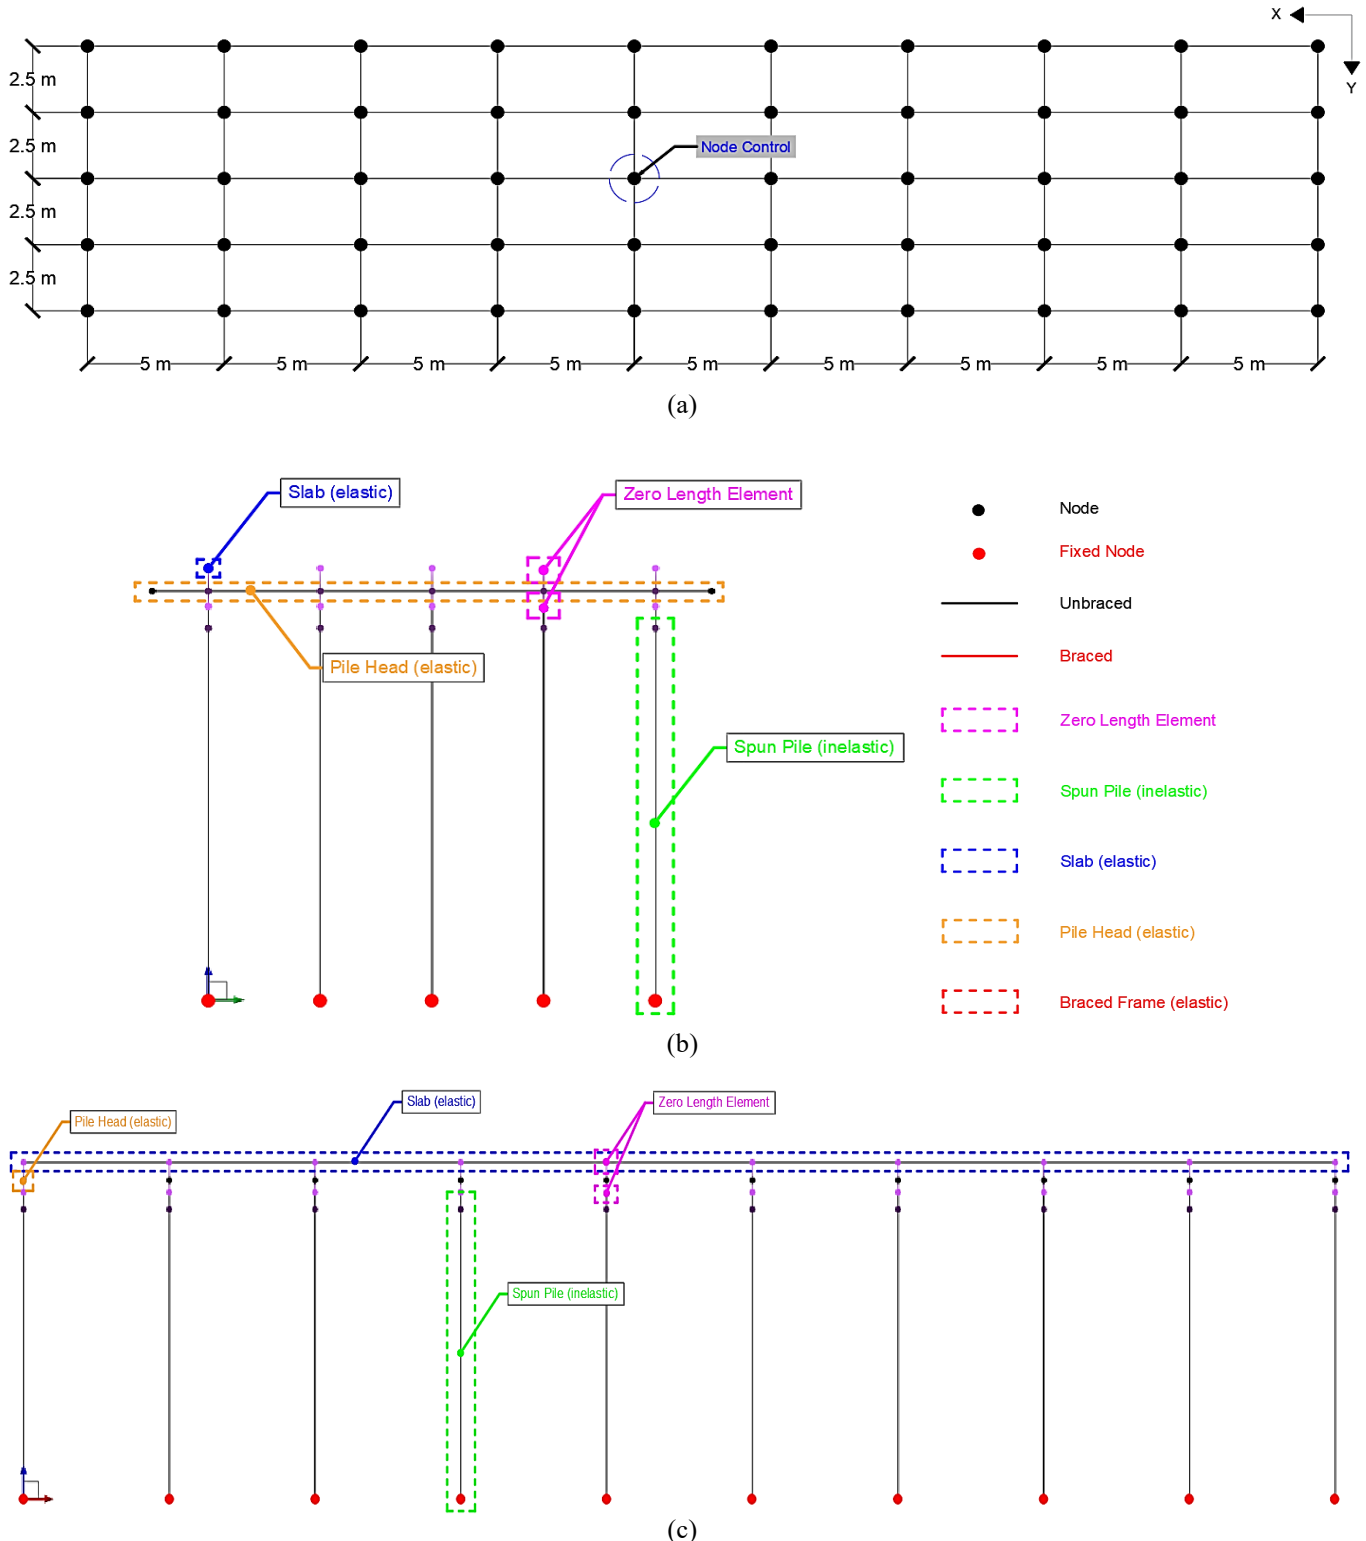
Structural Idealization of Slab-on-pile without Braced Frame: (a) Top View, (b) Front View, (c) Side View
